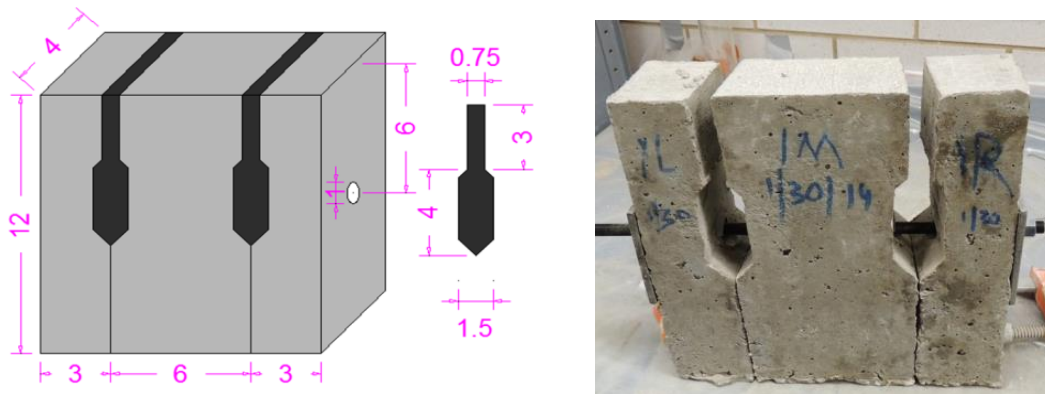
Details of Joint Tests Specimen with a Tie Rod
